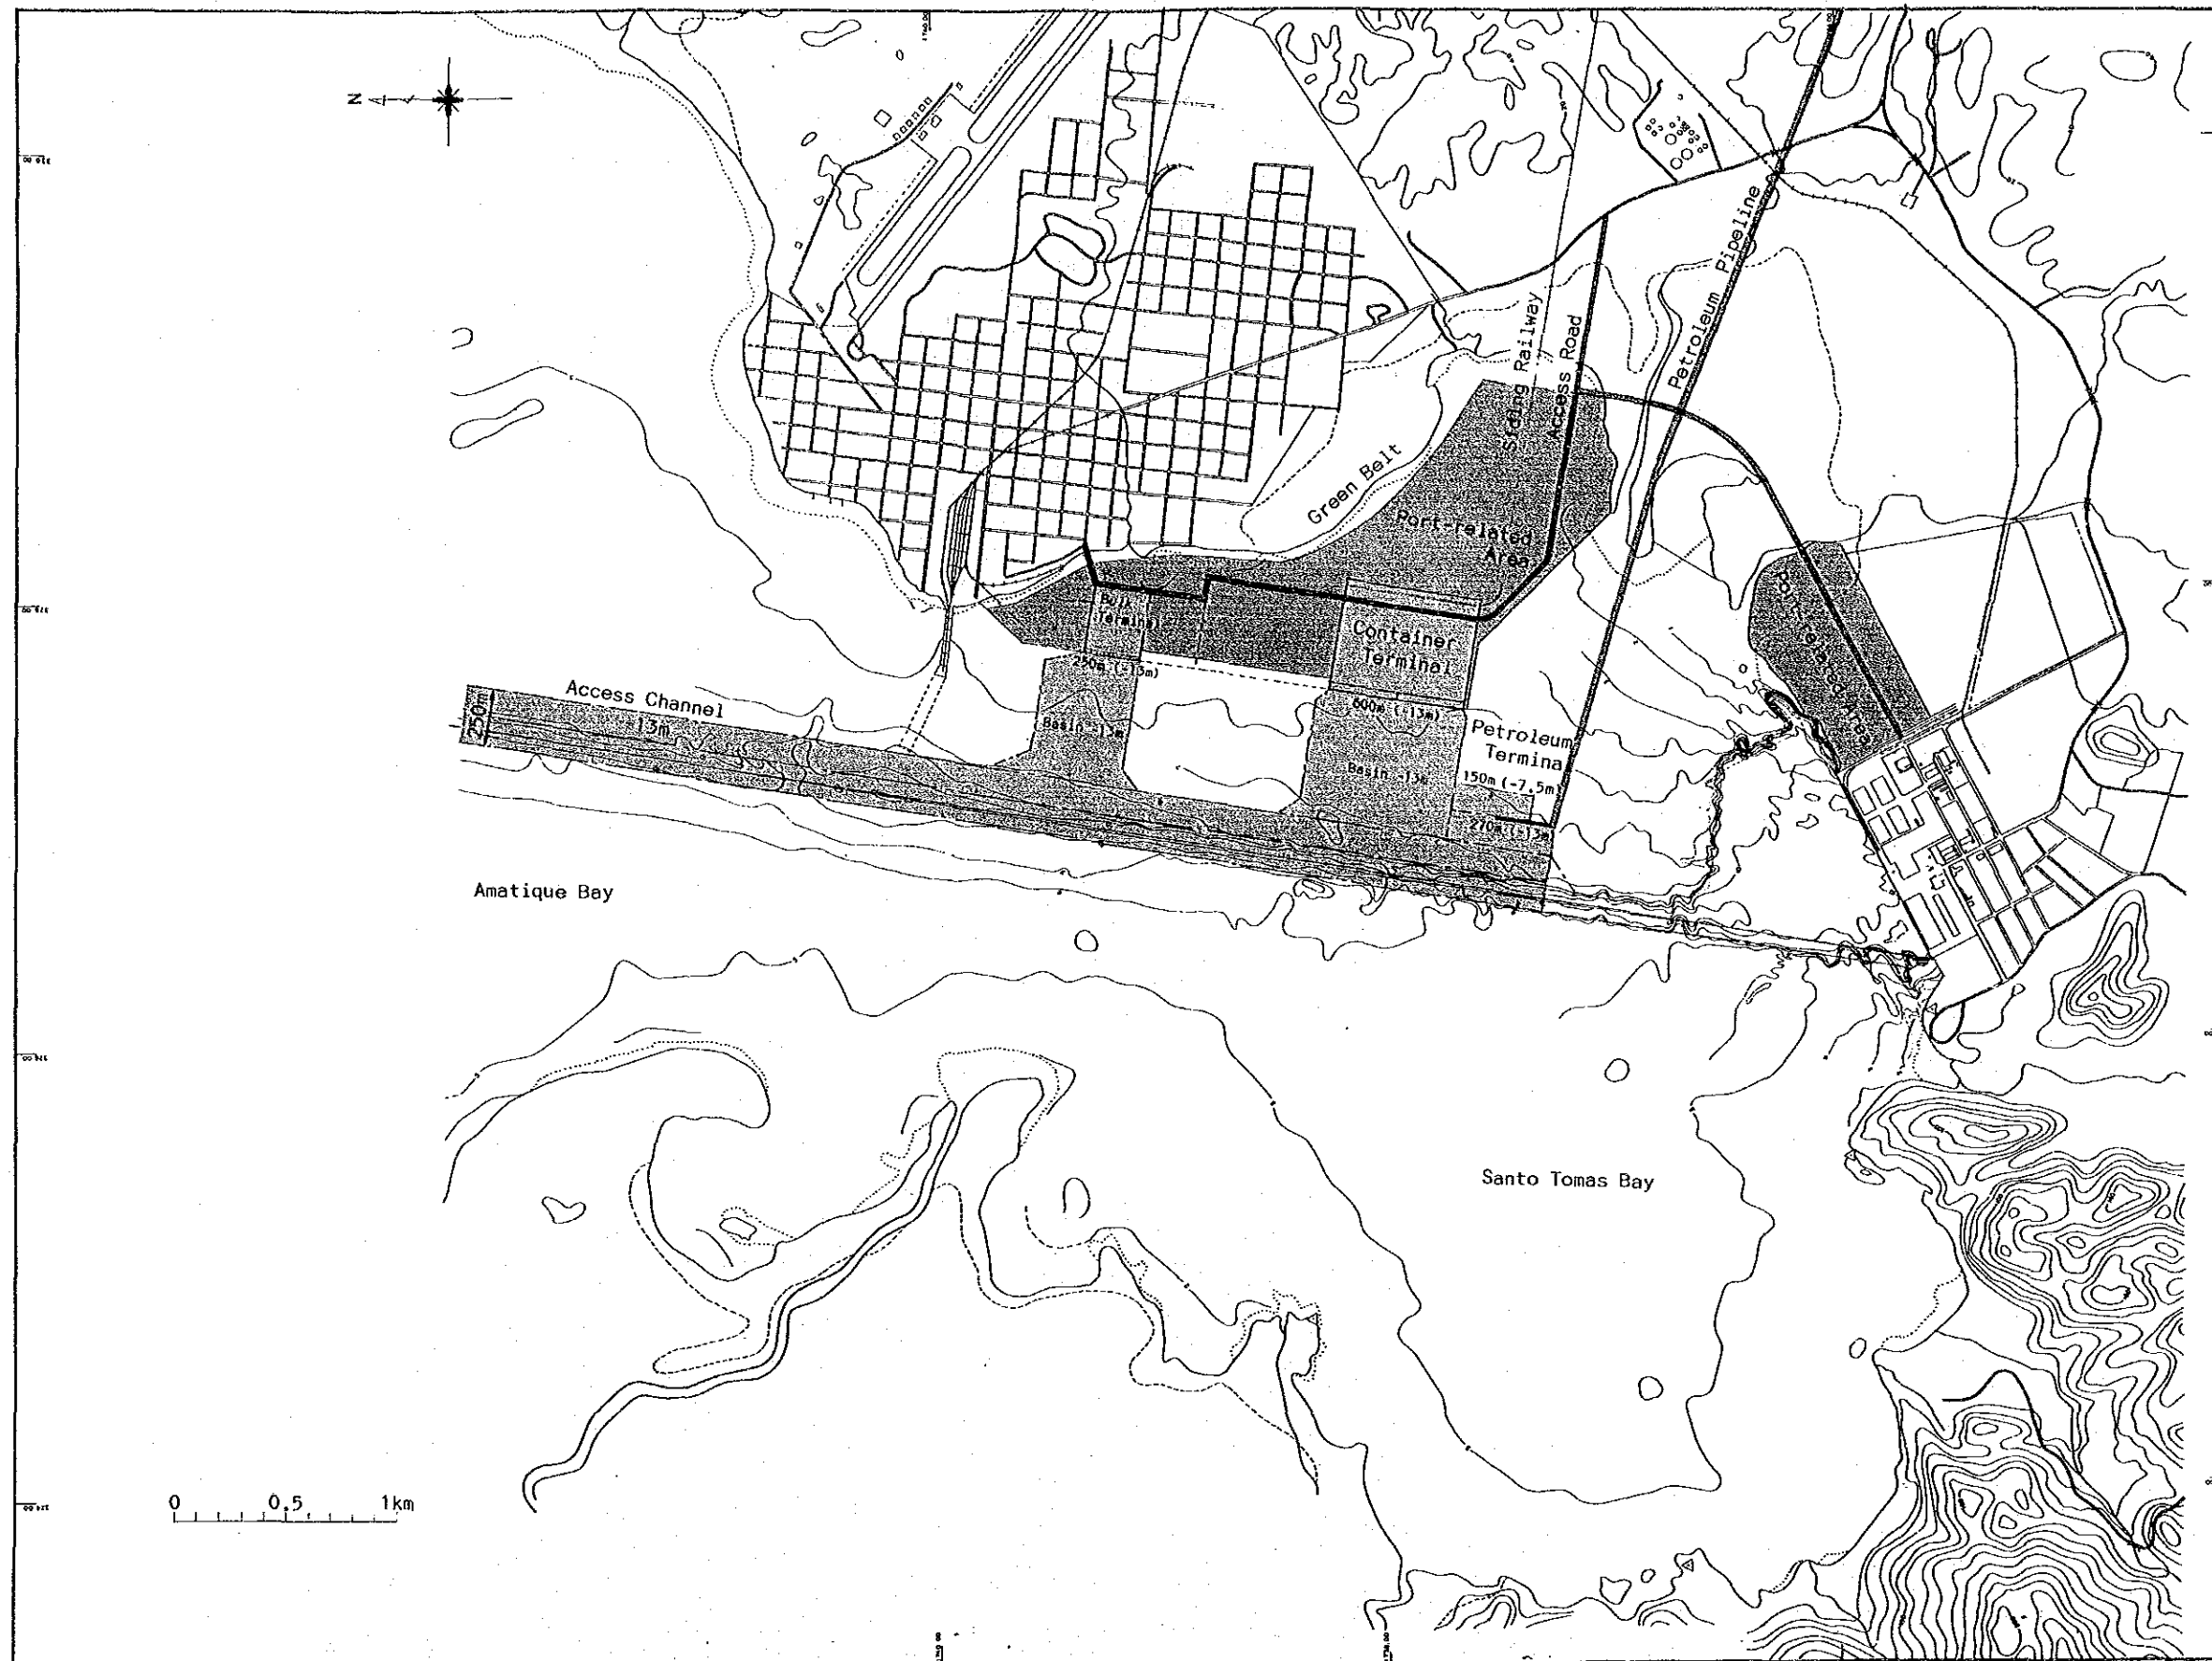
Alternative Layout Plan -- Case 3
